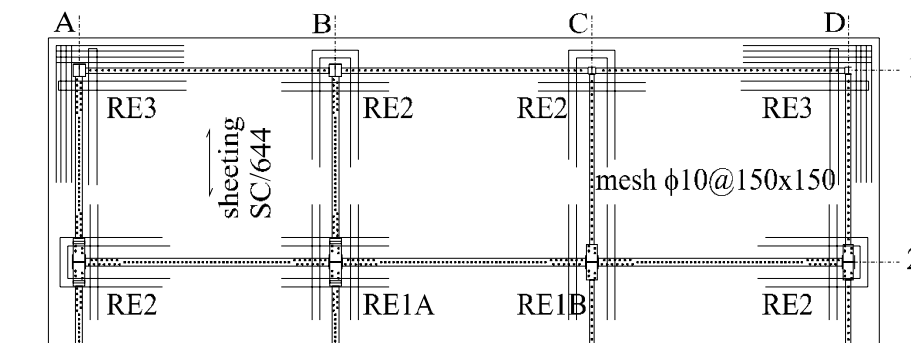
Layout of studs and re-bars on lines 1 and 2 of floor 1, 2 and 3
